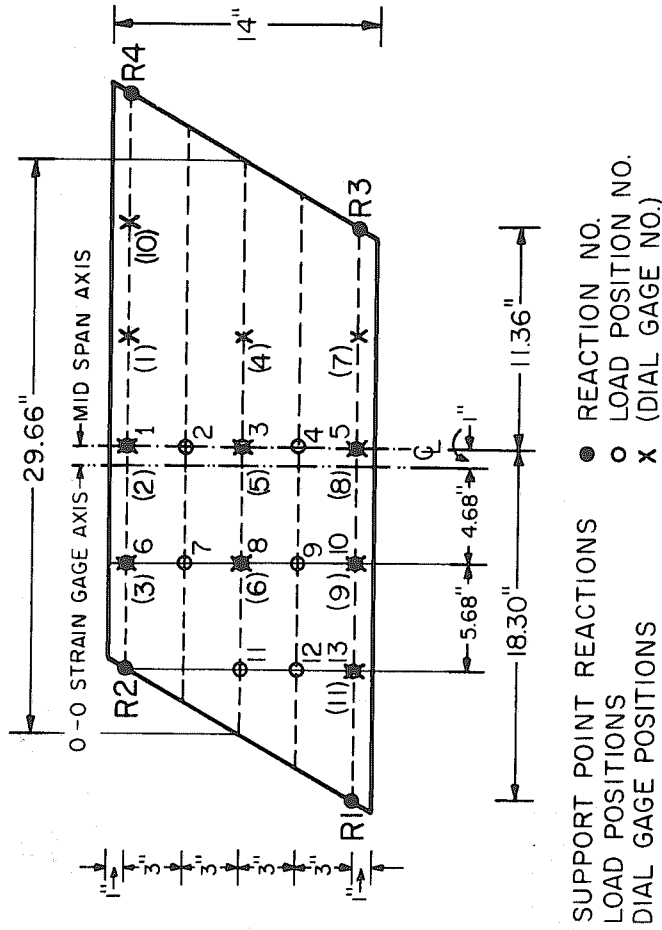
SKEW BOX GIRDER BRIDGE MODEL NO. 4,
